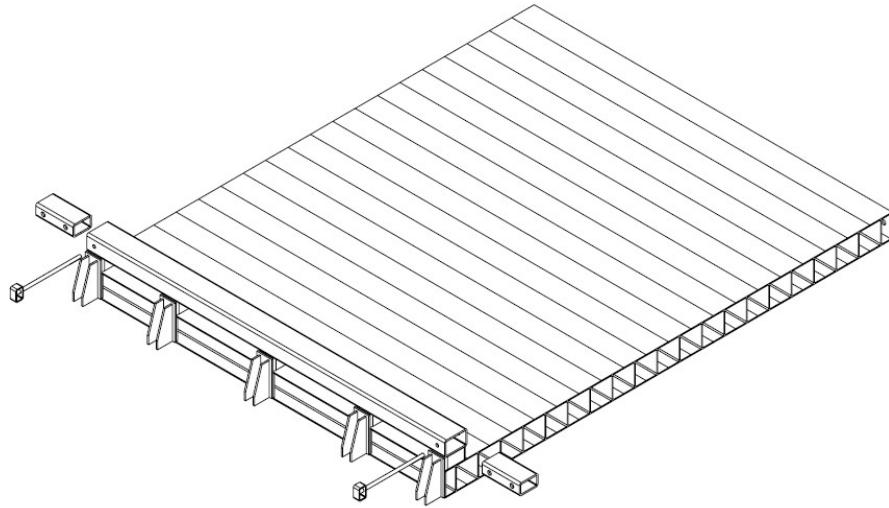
SSM - Structural Steel Mat (shown with optional curb system)
